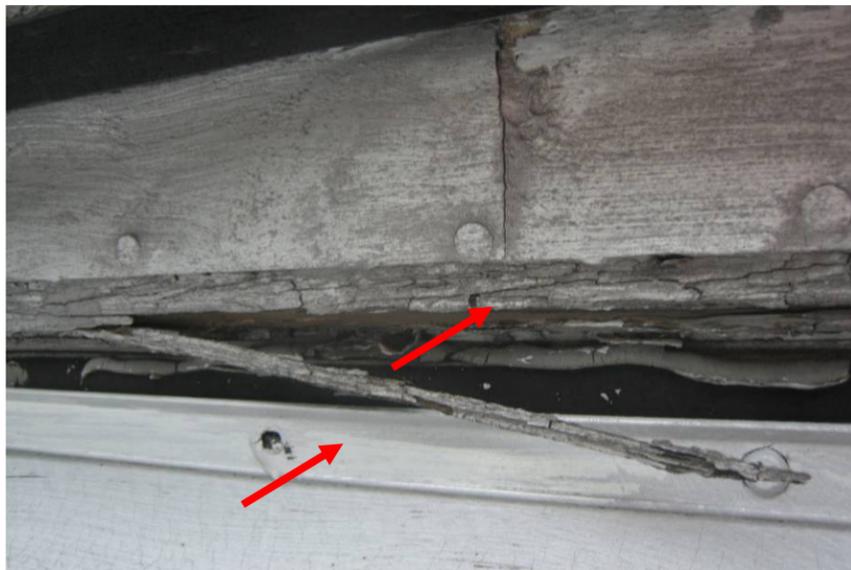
Deterioration of wood at termination of 1968 addition (Memorial Room) roof at cobblestone wall.
